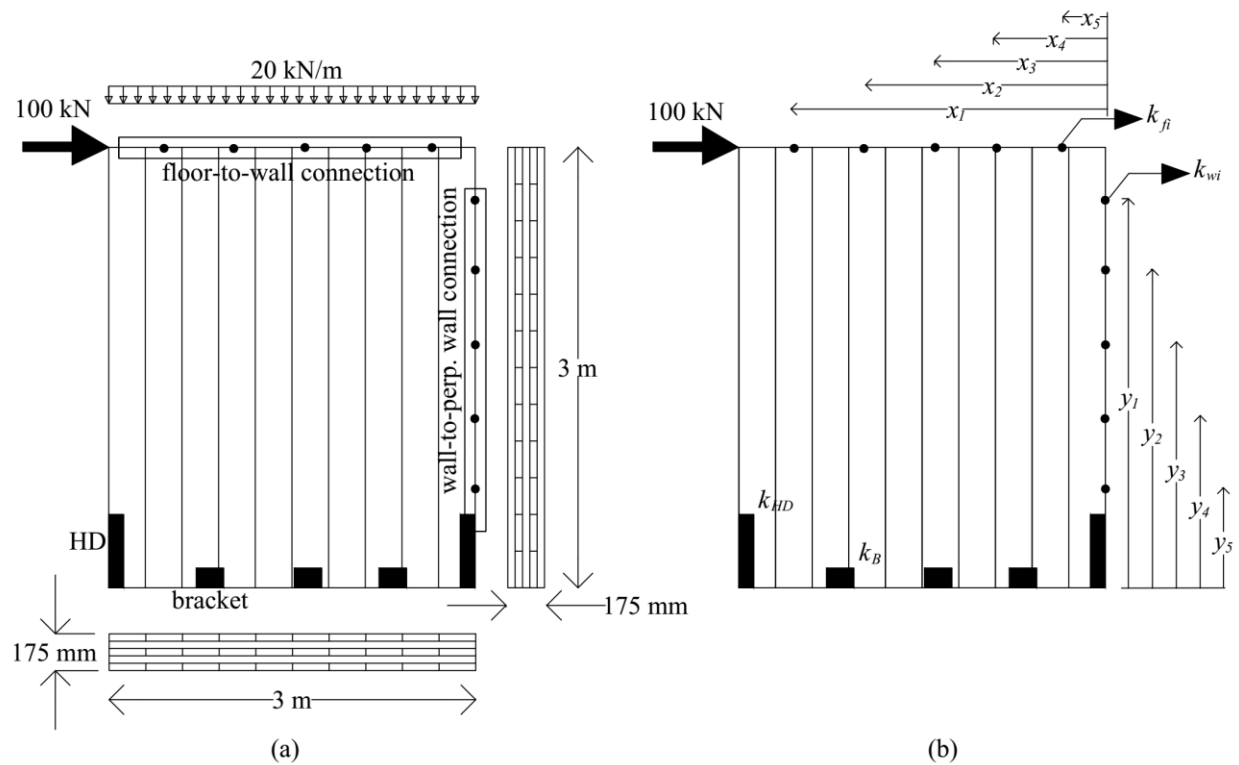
Deflection calculation in a single CLT shear wall with perp. wall and floor above: (a) schematic of wall with connections; (b) properties of connections
